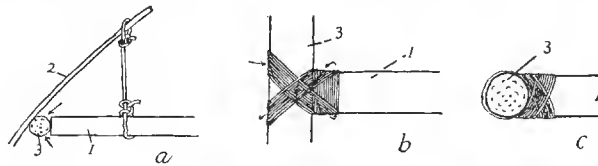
Lashing of collar beams to main purlins: 1, collar beams; 2, thatch rafter; 3, purlin: *a*, collar beam in position against purlin. The ends of the beam are not cut concave to fit exactly against the purlin but are left square as brought from the carpenters' shed. The spaces above and below the point of contact, as shown by the arrows, are filled in with coconut husk fibre to give the ornamental lashing an even surface to lie on. *b*, Completed lashing (*le sumu o le so'a*) as viewed from below. The technical details may be followed in the ridgepole lashing (fig. 14). Here the purlin corresponds to the ridgepole and the collar beam to the main post. Owing to the wider surface of the purlin, the main lozenge figure is worked on it whereas, in the other, it is worked on the wider surface of the main post. The sennit is fixed to the purlin with the usual slip knot and the arrows in the figure show the direction of the first course of the braid. The craftsman has complete control of his work from his position on the scaffolding. He sees to it that the first crossing is in the correct position on the under surface of the purlin and that the second crossing is in a corresponding position on the opposite upper surface. By following the ridgepole technique, the figure shown develops automatically. The lozenge motive is formed on both the lower and upper surfaces of the purlin and extends outwards on the part filled in with coconut husk. The upper figure though not seen from below is necessary for the even development of the lashing. *c*, Side view not seen from below. A collar of lashing has been made around the beam, holding quite well, but the weight is also carried by the direct lashings to the main post.
